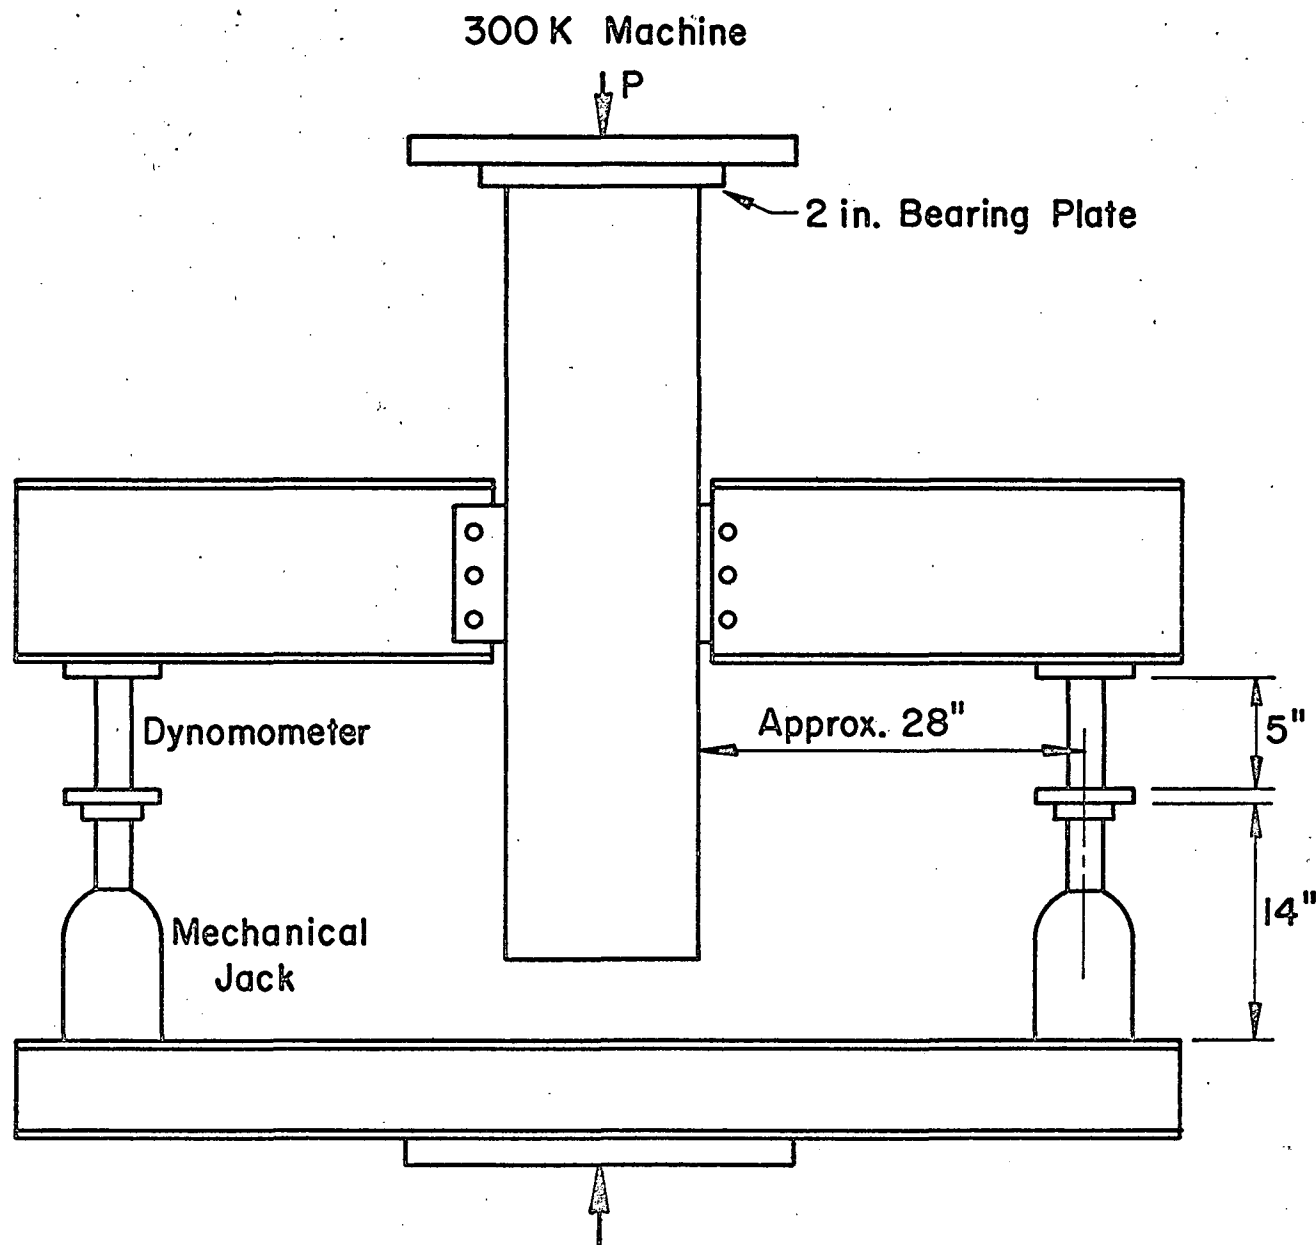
SKETCH OF ELASTIC LOADING TEST SETUP
